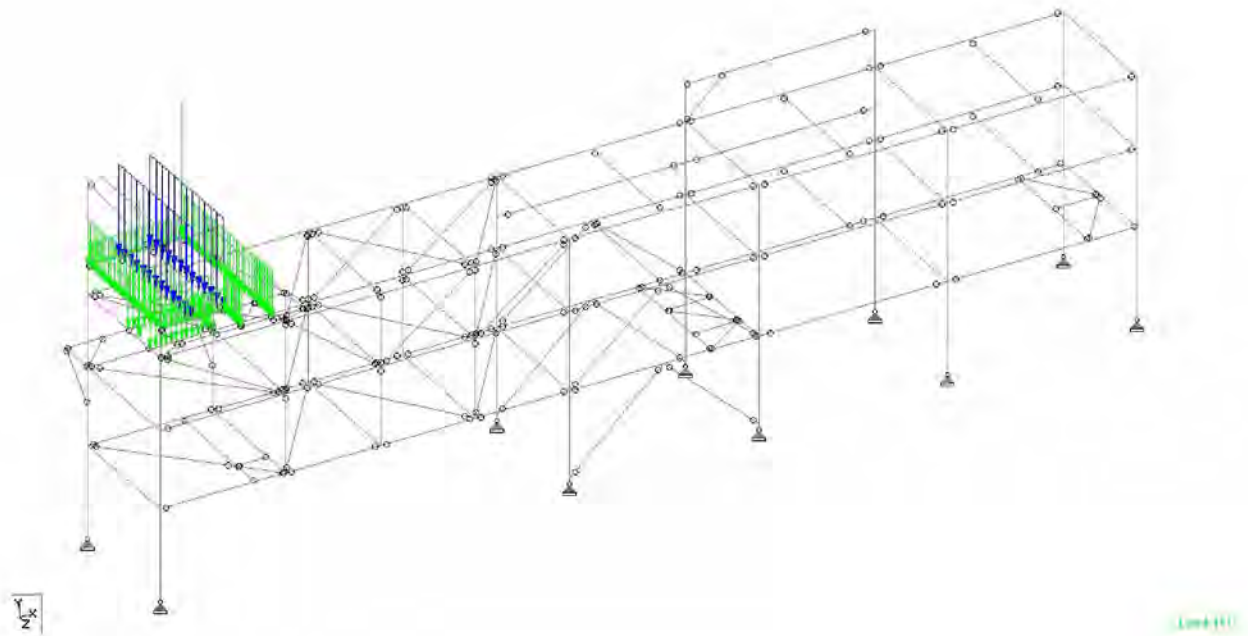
Dead load of Grating, handrail, & Ladder
